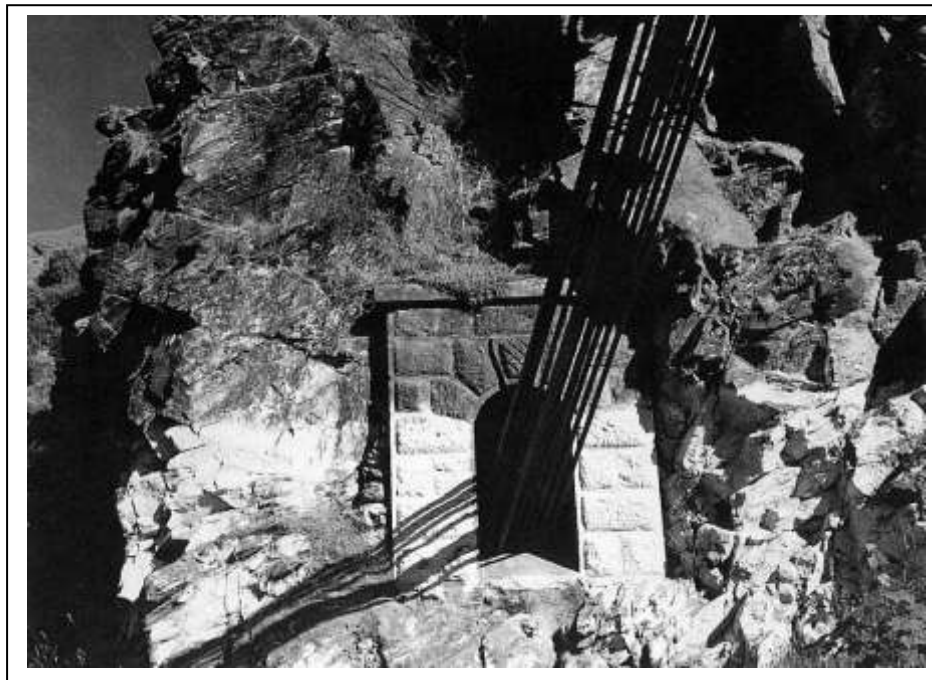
One of the northern anchorage tunnels. Thornton, p.184
